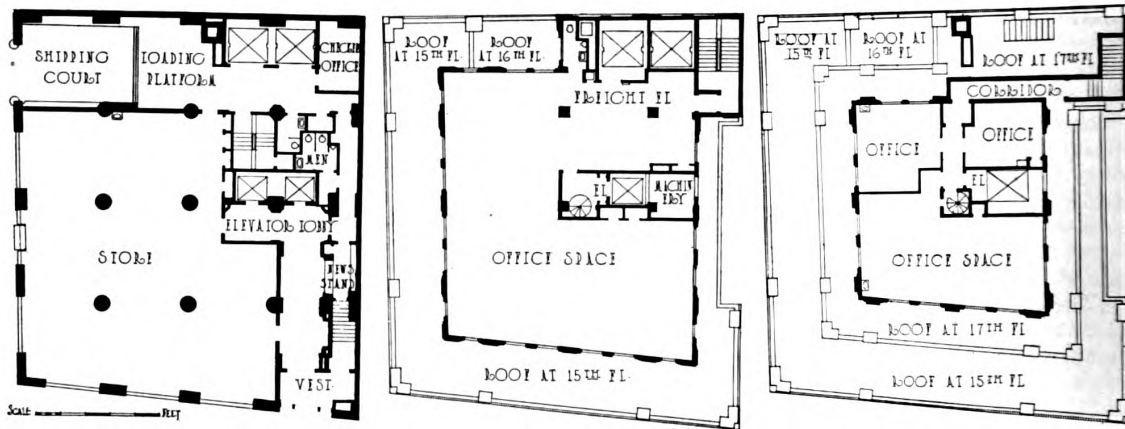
First, Sixteenth and Seventeenth Floor Plans, Hide & Leather Building
